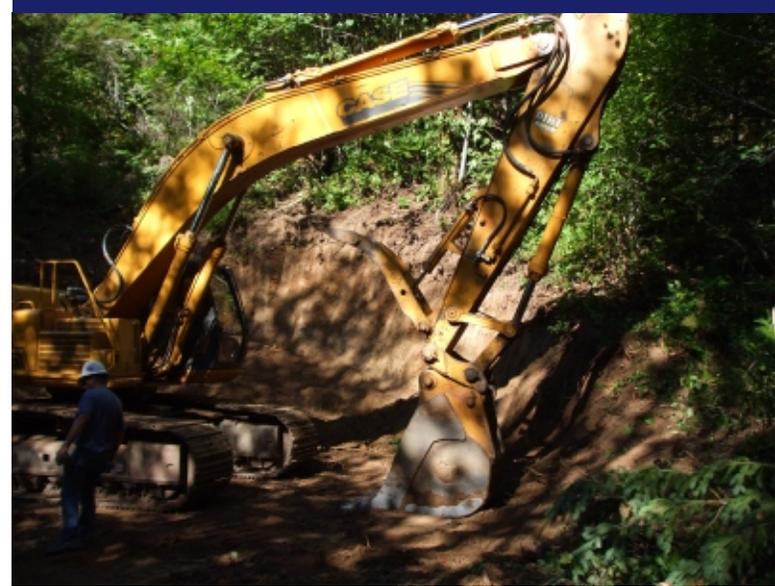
Soil removal area near New Furnace for final Main Tailings Pile slope cover.
